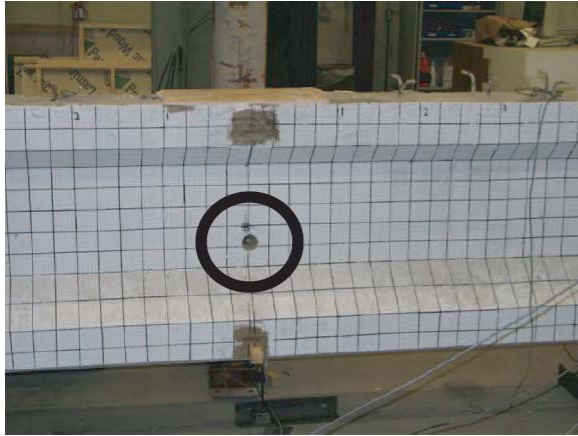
Location and extent of some of damages of the I-244 Bridge girder. These damages include both caused by removing the girder from the bridge and clean-up process.
